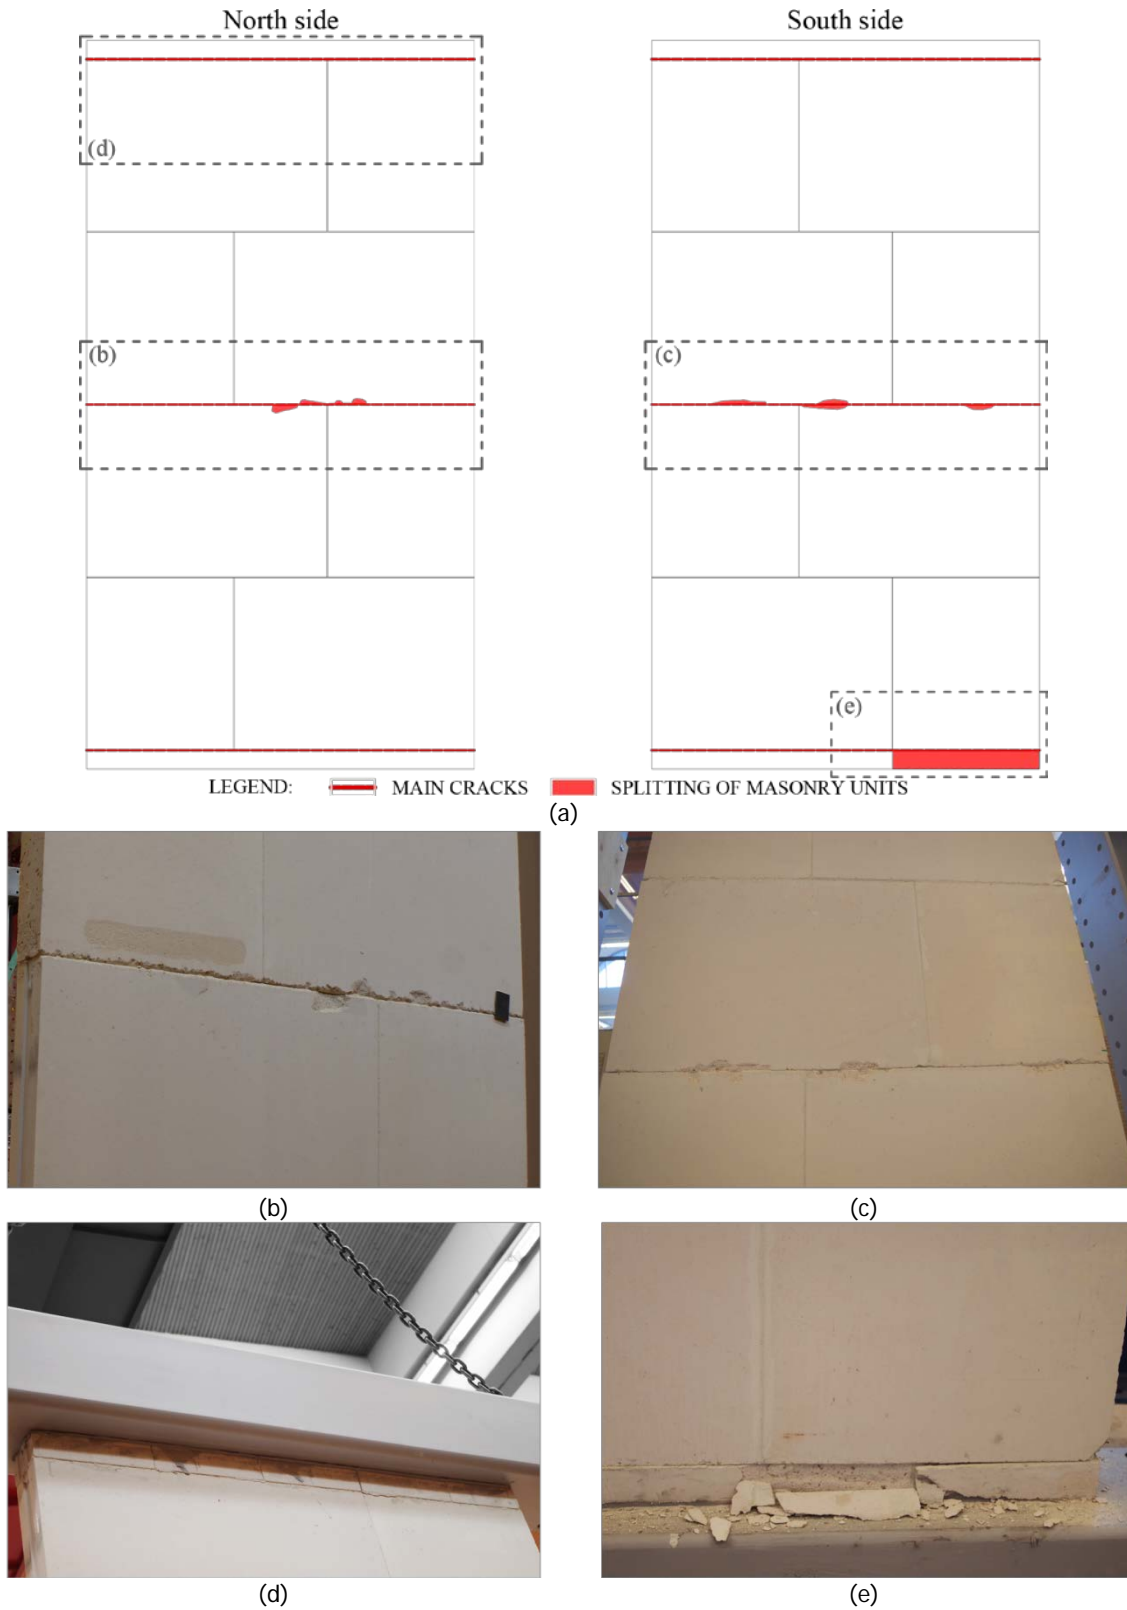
Crack pattern TUD\_COMP-28: (a) drawing; (b) mid-height crack North side; (c) mid-height crack South side; (d) top crack North side; (e) splitting of the bricks in the bottom South row.
